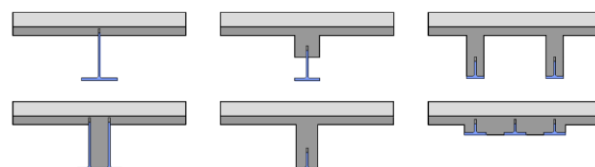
PrecosBeam steel-concrete composite cross-sections [6]
